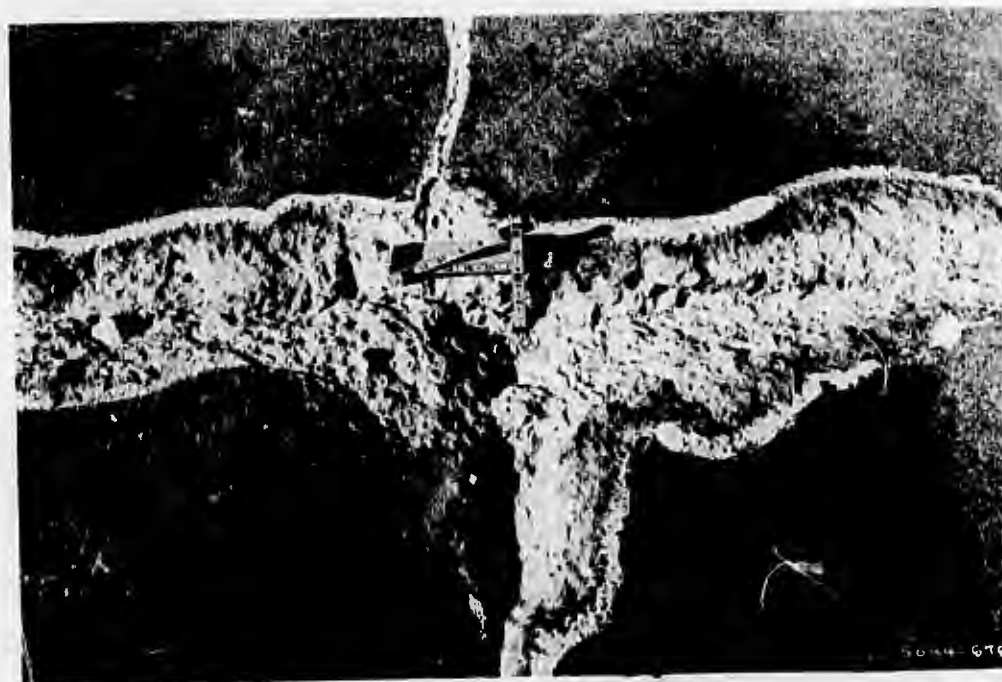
Severely spalled crack in a plain concrete test pavement at complete failure
